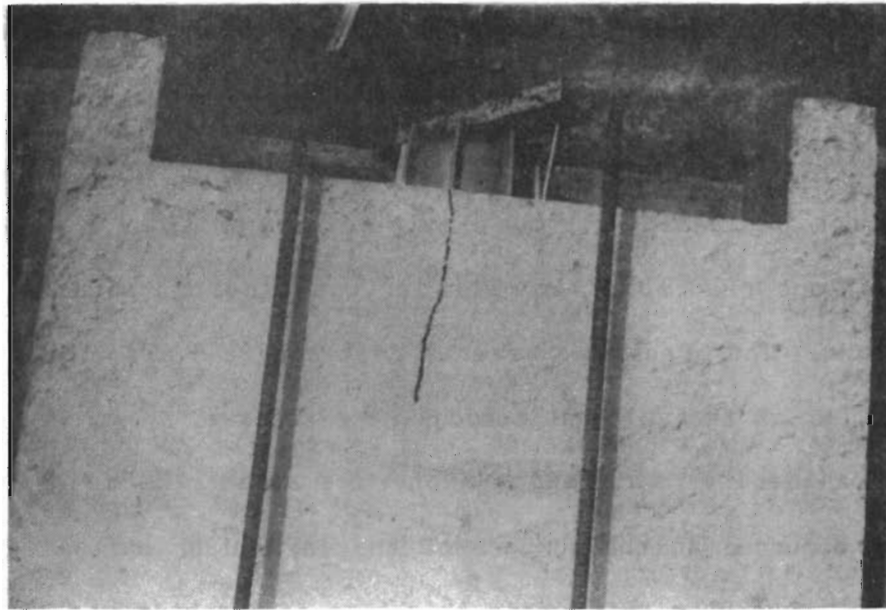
Cracking in wing anchorage zones after first stage wing post-tensioning (cracks highlighted with black marker for better visibility)
